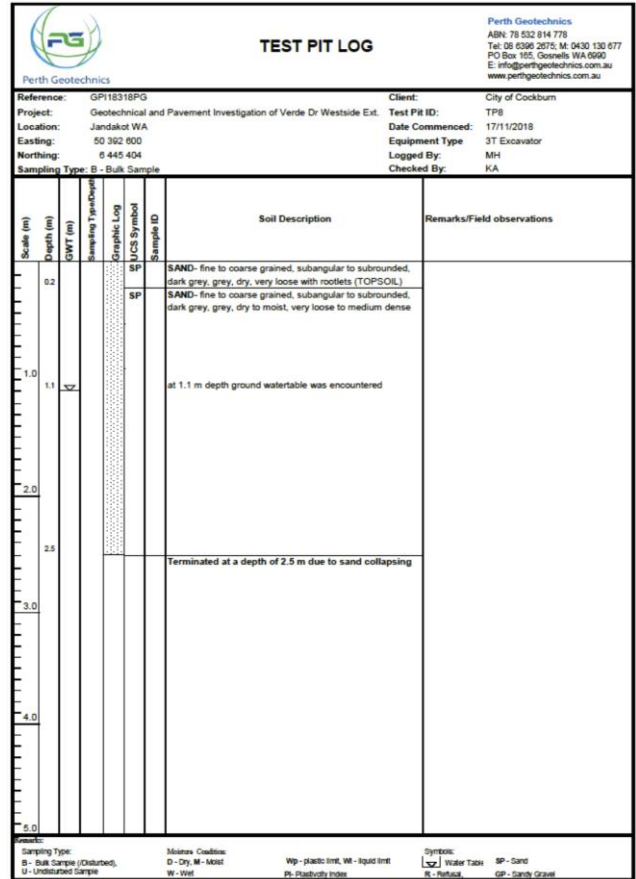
Test Pit Log (Verde Dr.) at Location TP8
